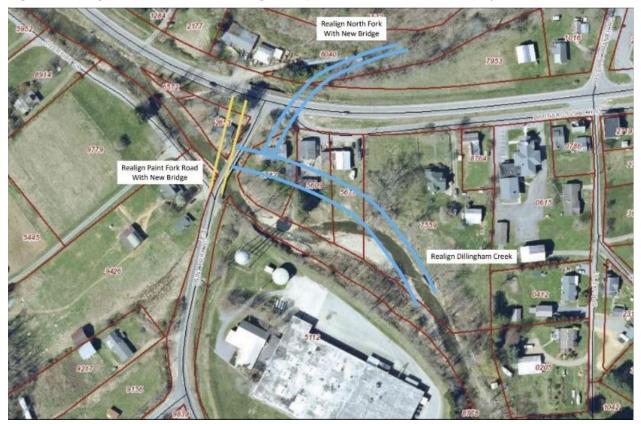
Bridge 100154 and 100078 realignment plan with stream restoration project
